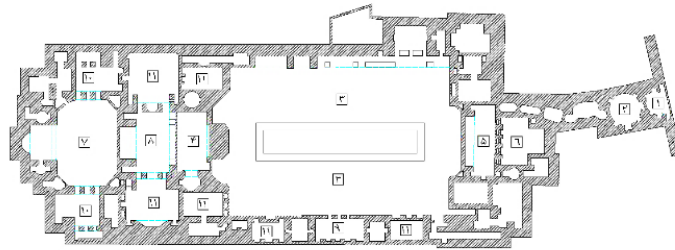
The boroujerdi house, ground floor plan (cultural heritage and tourism organization).
